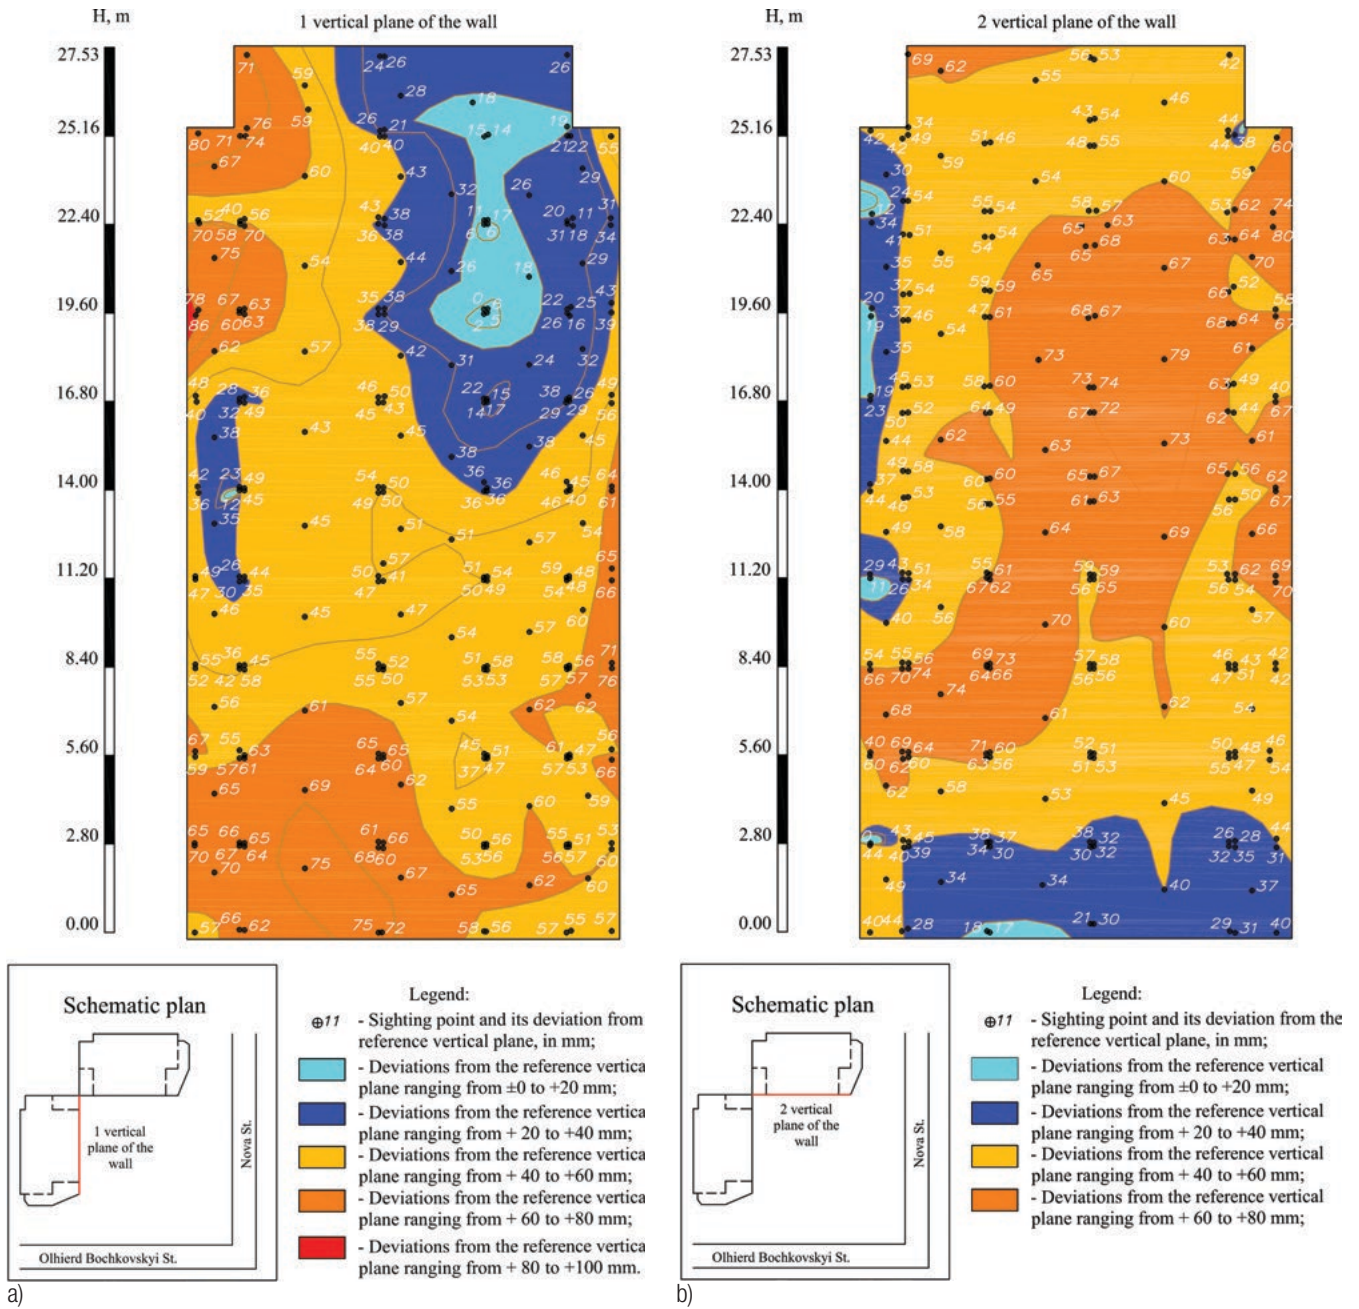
| Results of determining vertical deviations of the a) wall in section 3 and b) wall in section 1-2
